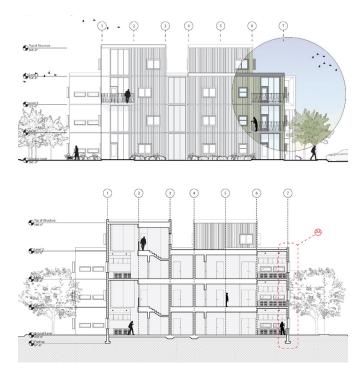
An exterior elevation (above, top) and section (above, bottom) of the post-and-plate apartment building concept. The project achieves formal variation utilizing a highly constrained and repetitive structural system. Work by Kade Jensen and Dylan Lambe.
